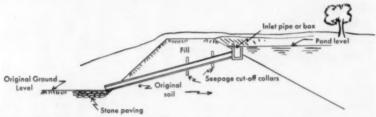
Where a drain is not needed, a short concrete riser instead of a steel pipe riser may be placed on the side of a dam.
